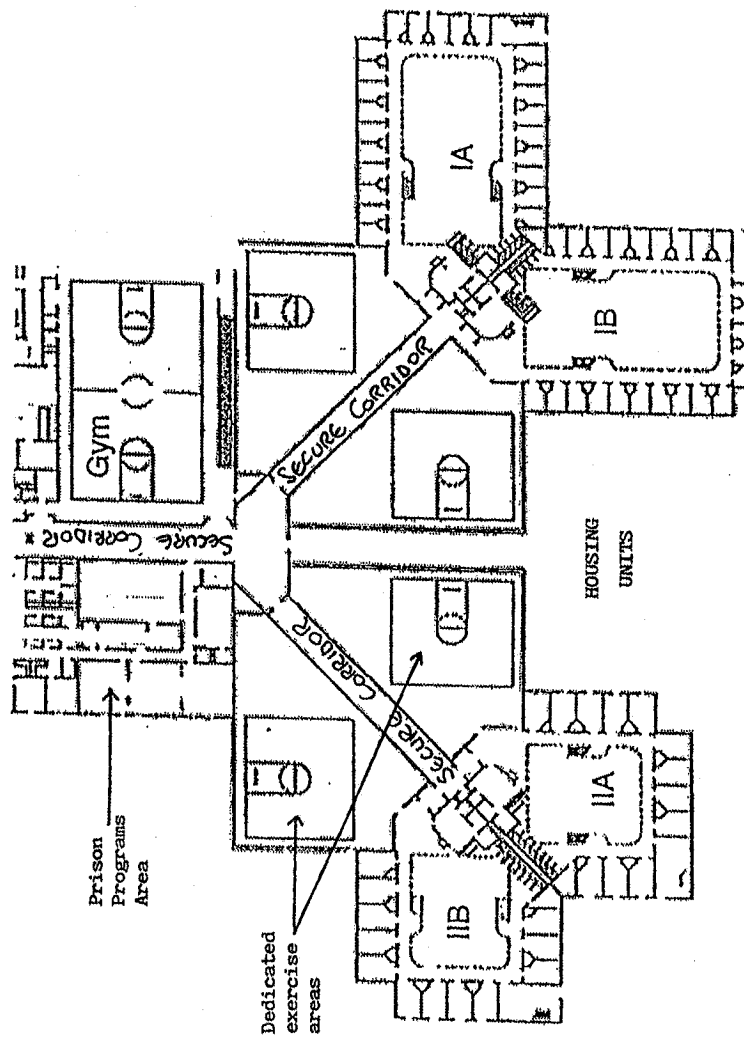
Floor plan of part of a "new generation design" prison. Source: Adapted from part of floor plan of Norfolk County Sheriff's Correctional Center, Mass., as illustrated in Farbstein, Liebert, and Sigurdson (1996, p. 15).
